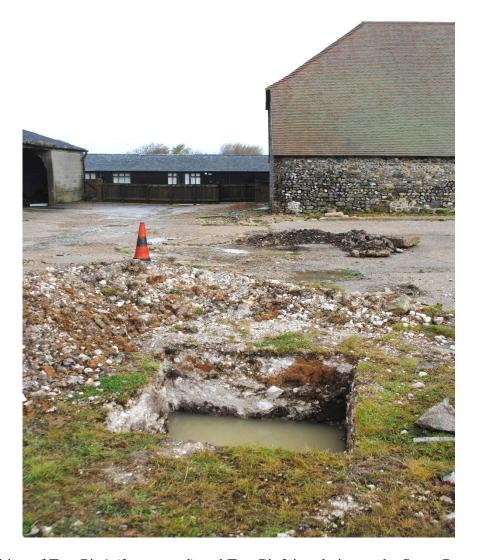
Plate III Position of Test Pit 1 (foreground) and Test Pit 2 in relation to the Stone Barn, looking north
